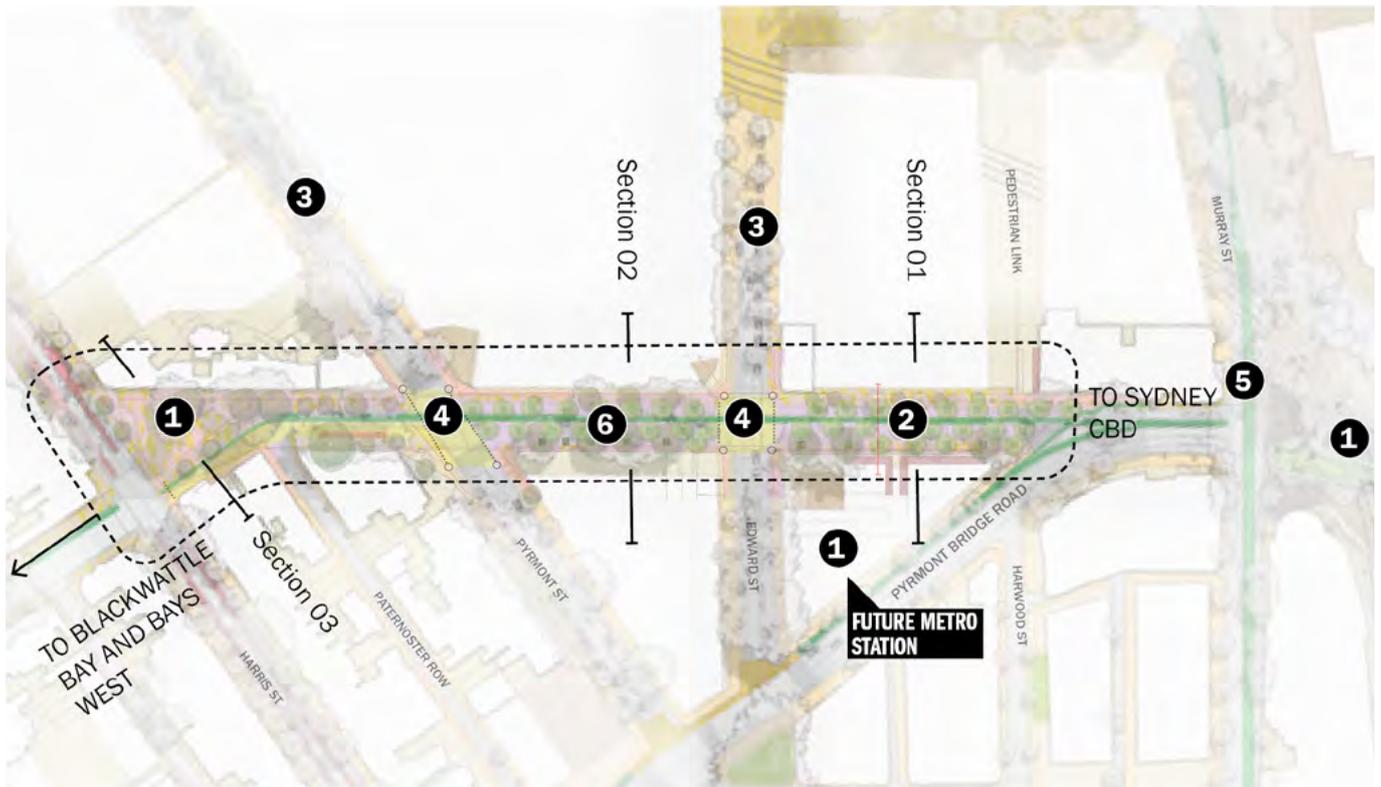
/ Plan of Union Street Character Area (Hassell)
